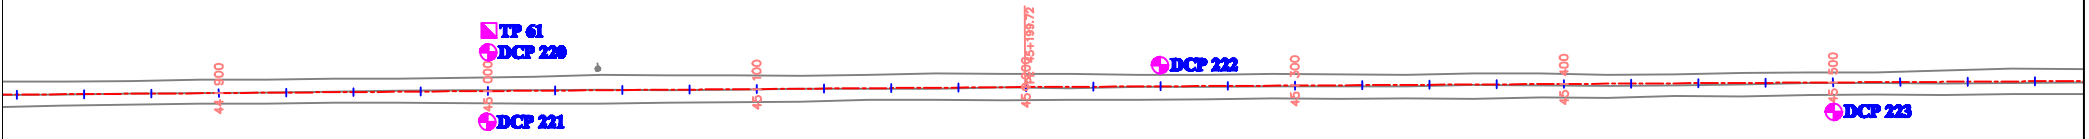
Location Plan of Test Pit Log and DCP Test
